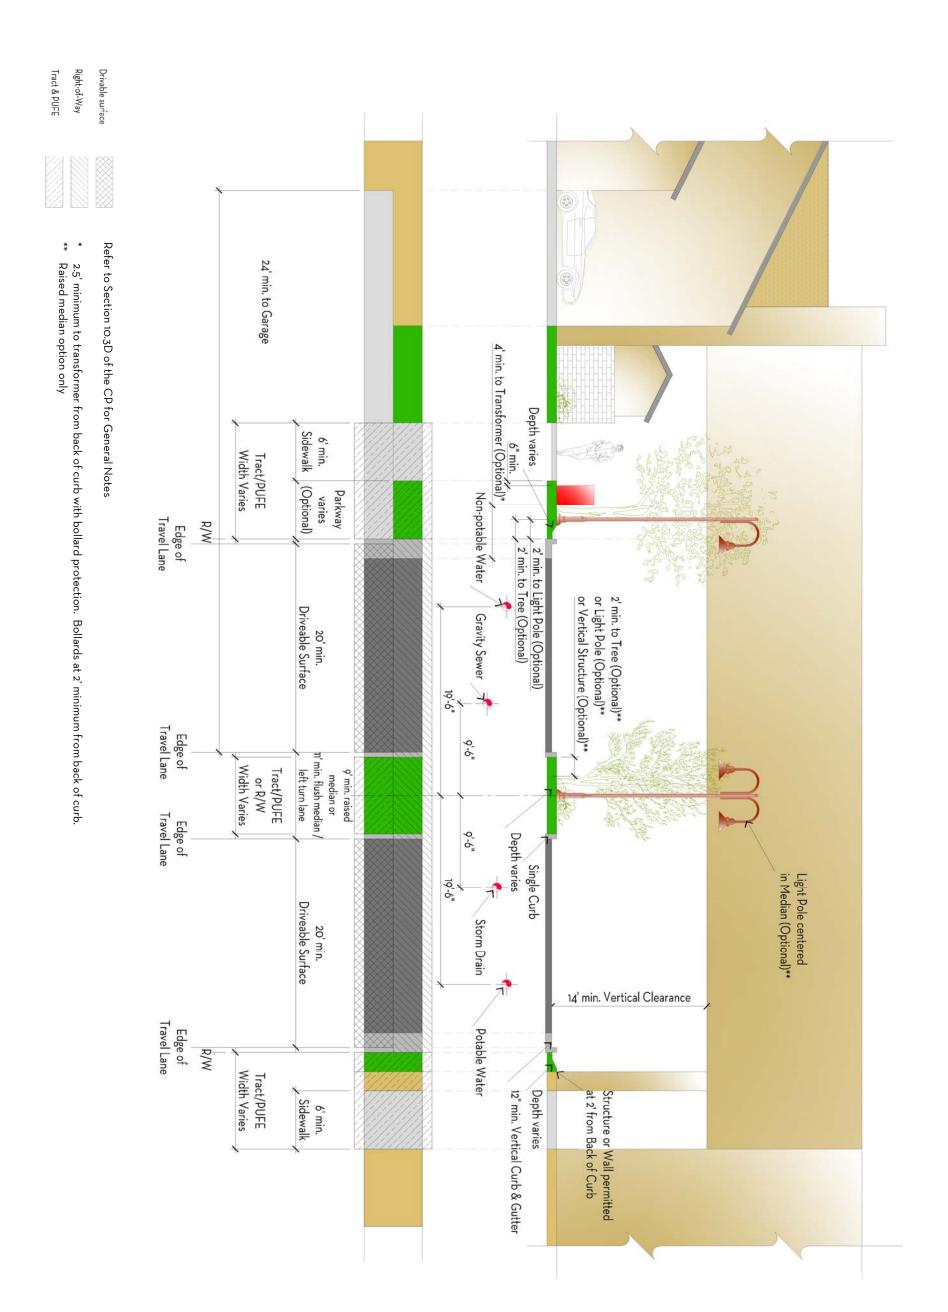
Two-Way Four Lane District Street - Detailed Cross Section
